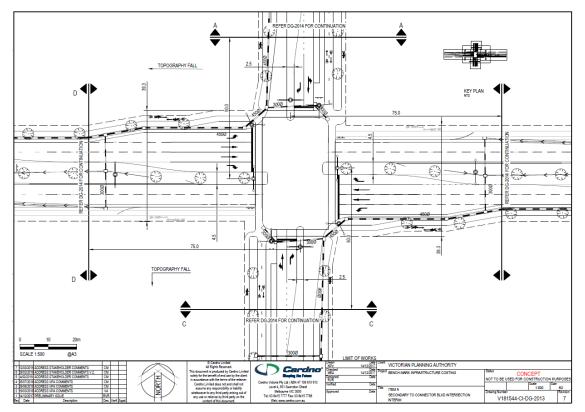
VPA Benchmark Infrastructure Report - Secondary to Connector Boulevard Intersection Layout
